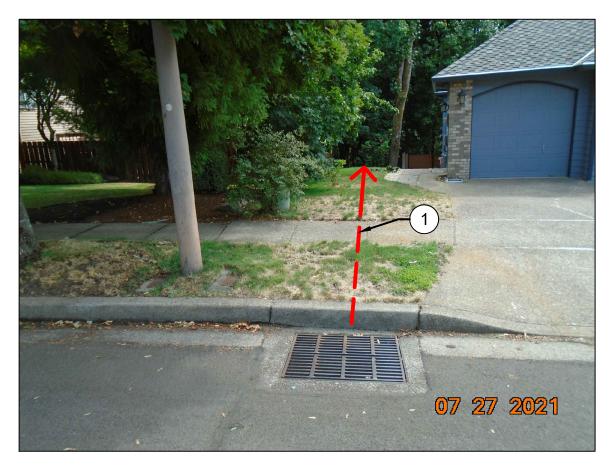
VIEW LOOKING EAST FROM swIN-008144 TO swCPT-00375
